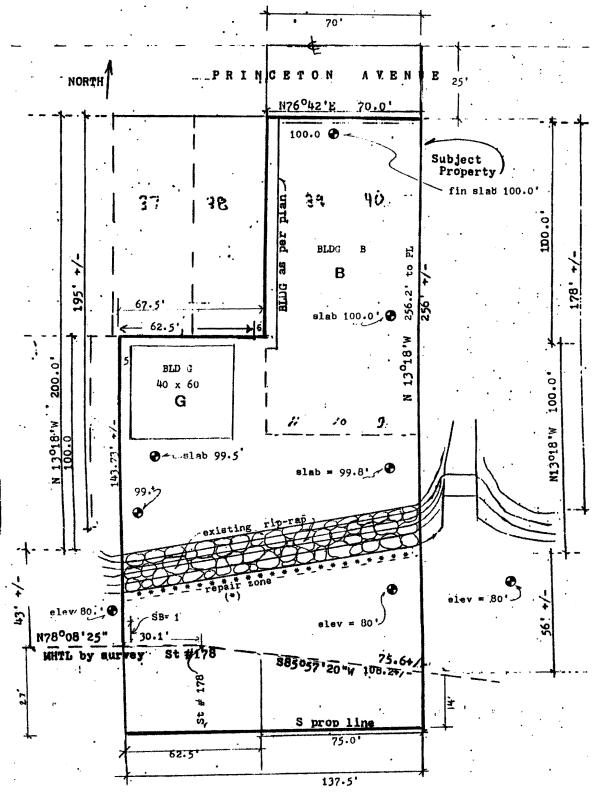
REPAIR PLAN 380 PRINCETON AVE
